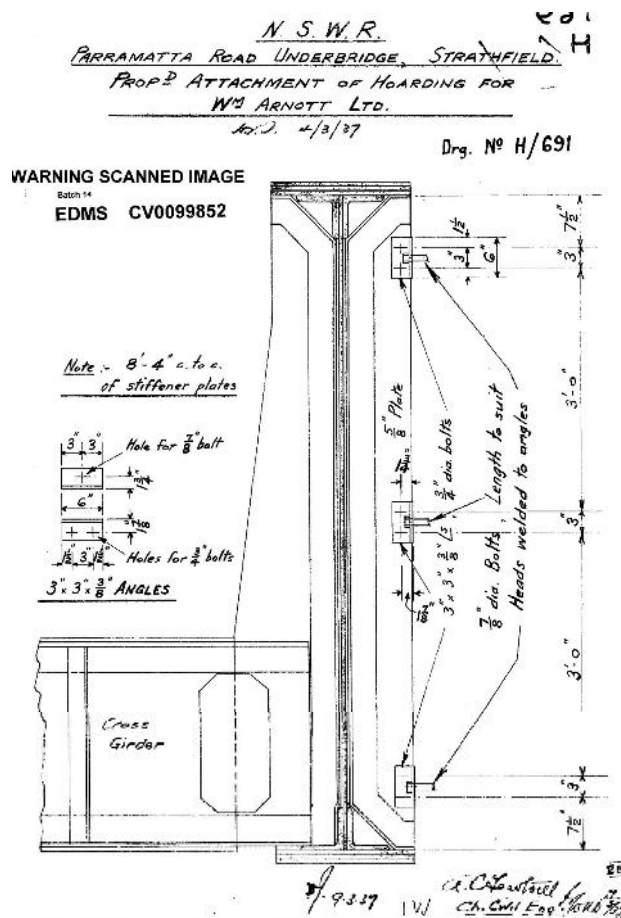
Parramatta Road Underbridge, plan of proposed attachment of hoarding for William Arnott Ltd, 1937. (RailCorp Plan, Ref: 0099852)
